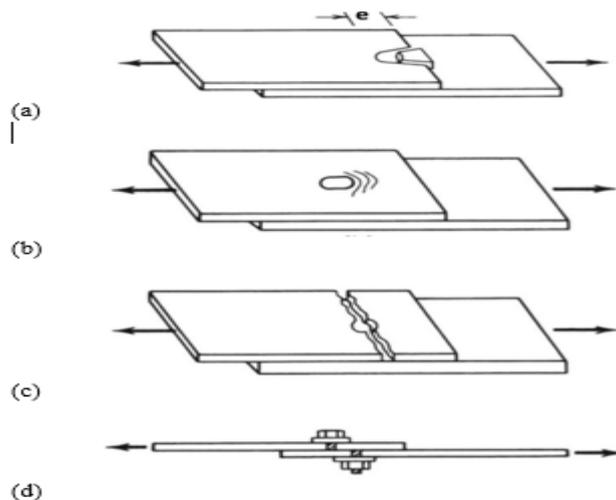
Failure modes of bolted connections in shear: a) tear-out failure of sheet, b) bearing failure of sheet, c) tension failure of net section, d) bolt shear failure.
